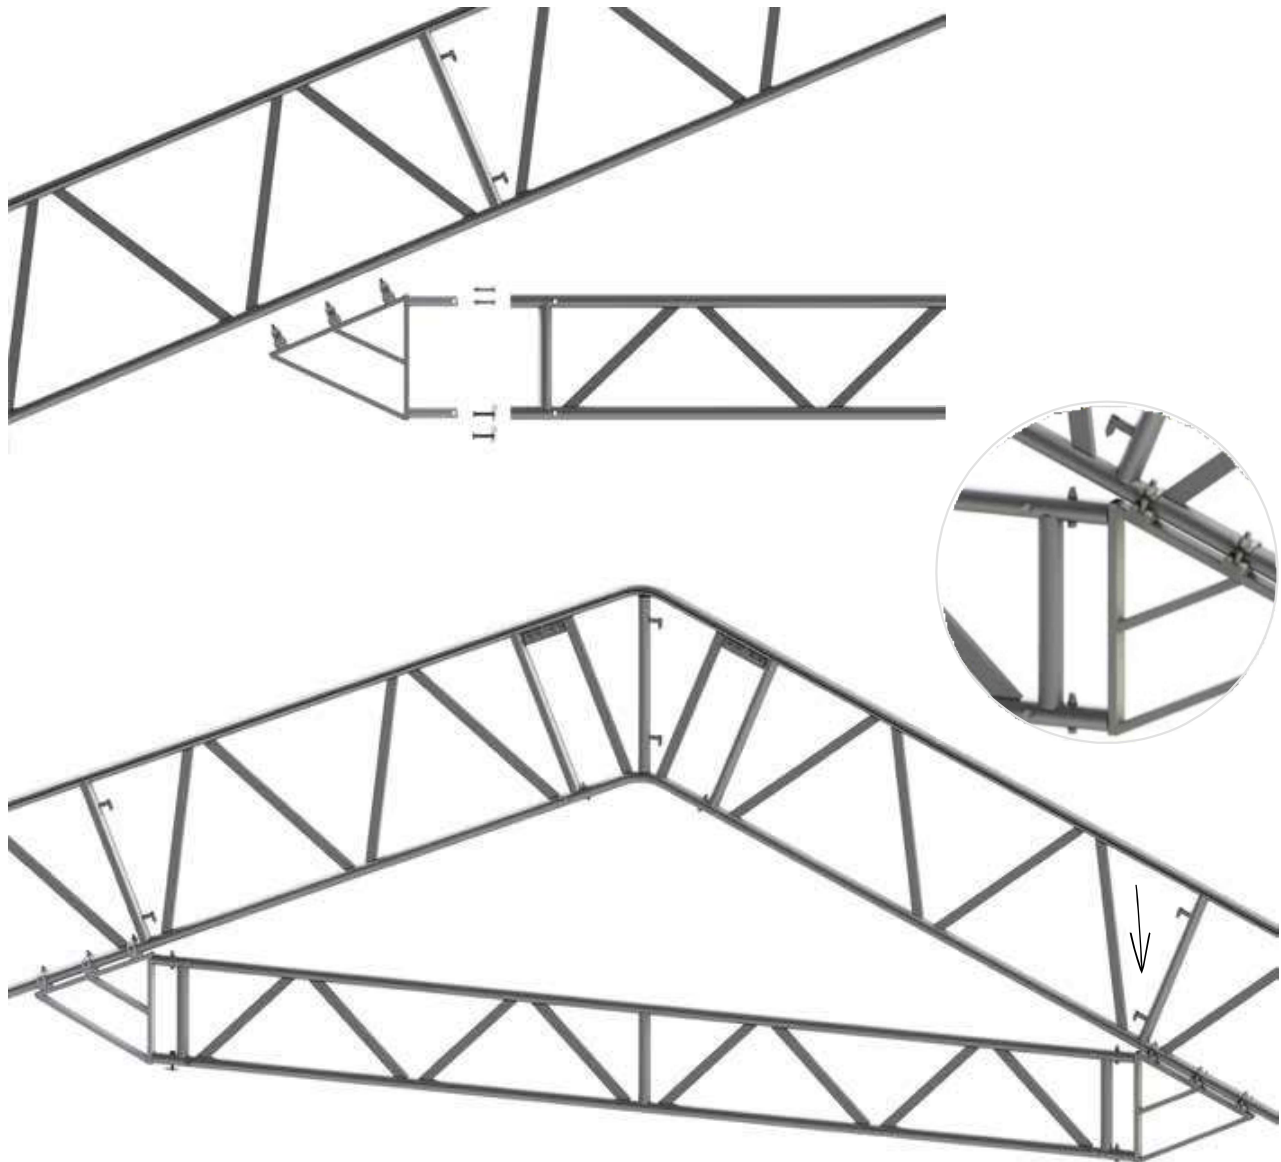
Connection of clamp connectors with 0.40 m girders to the roof span.
